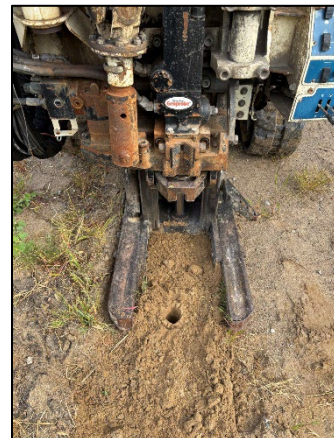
Viewing 8649 SB03 Drilling, Facing North.
